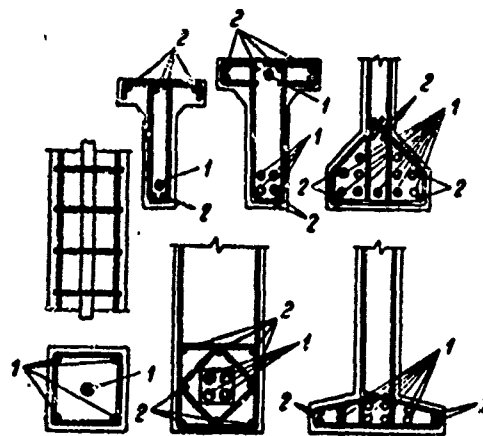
Diagrams of the arrangement of stressed and unstressed reinforcement in the transverse section of prestressed reinforced-concrete elements. 1 - stressed reinforcement; 2 - unstressed reinforcement.
